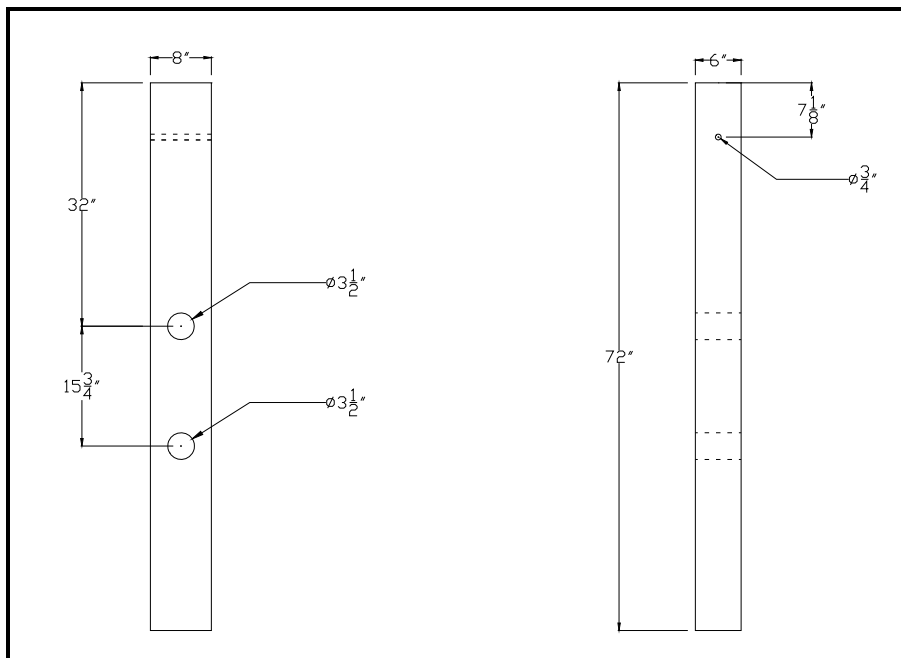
Cross-Sectional Dimensions for CRT Wood Posts - English
